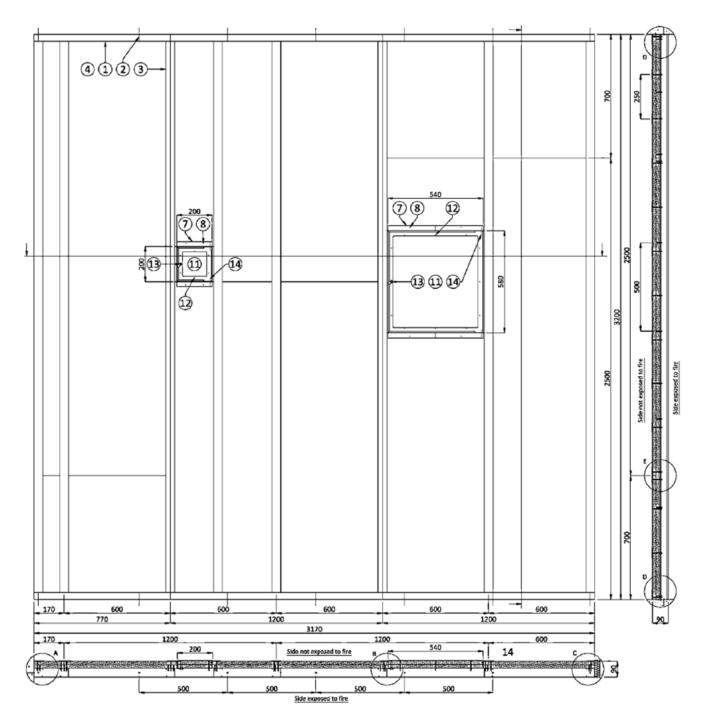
Schematic presentation of the assessed installation
